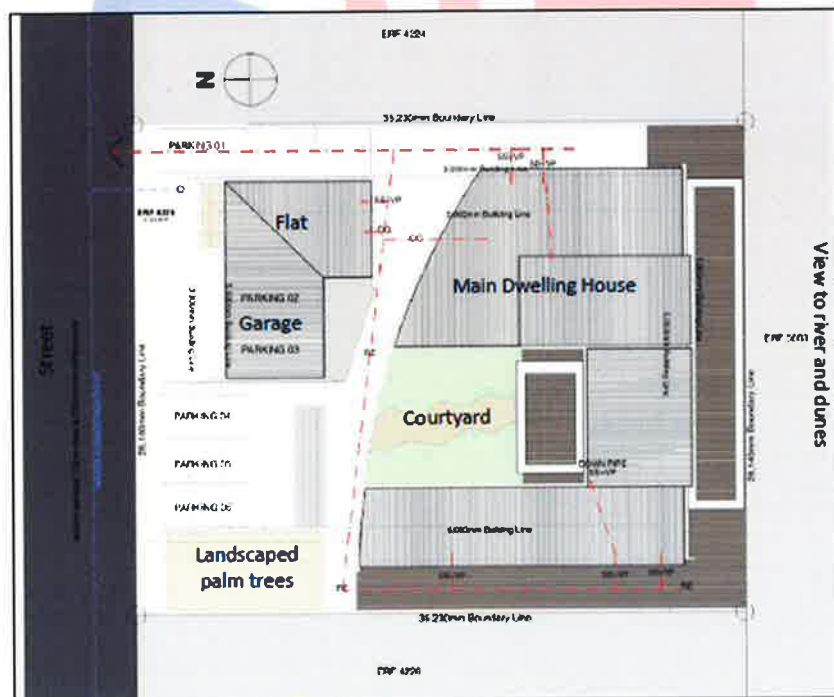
Site Plan for Erf 4225 Swakopmund Extension 13 (Credit: Chrismari de Wit)
